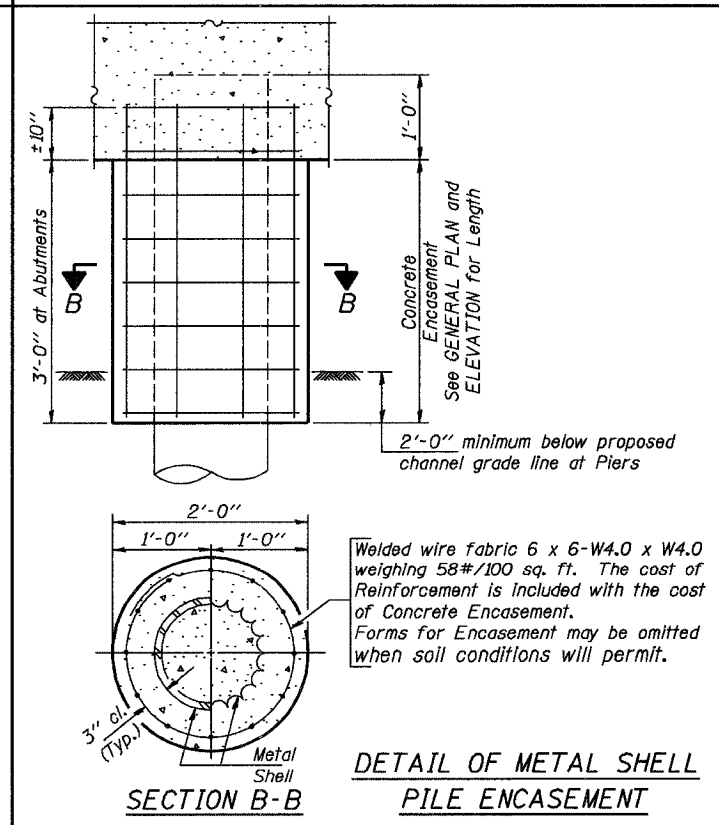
DETAIL OF CYLINDRICAL STEEL SHELL FOR CAST IN PLACE CONCRETE PILES
